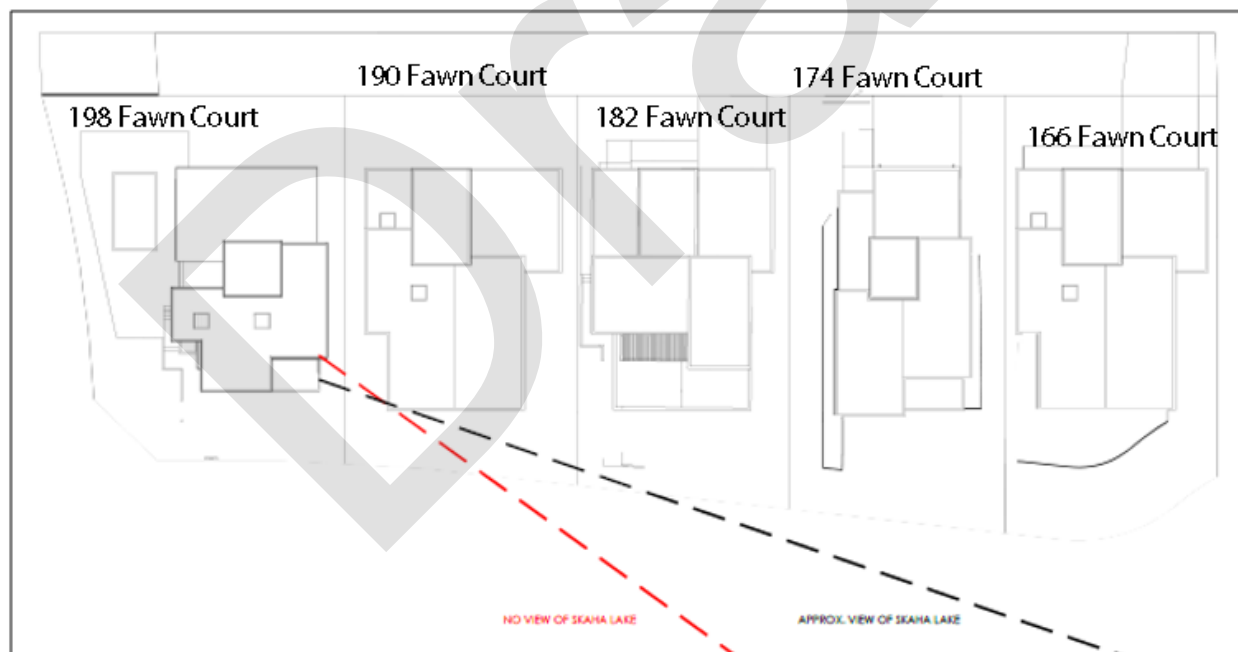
Site Plan Showing Line of Building Facades on Street and Sightlines
